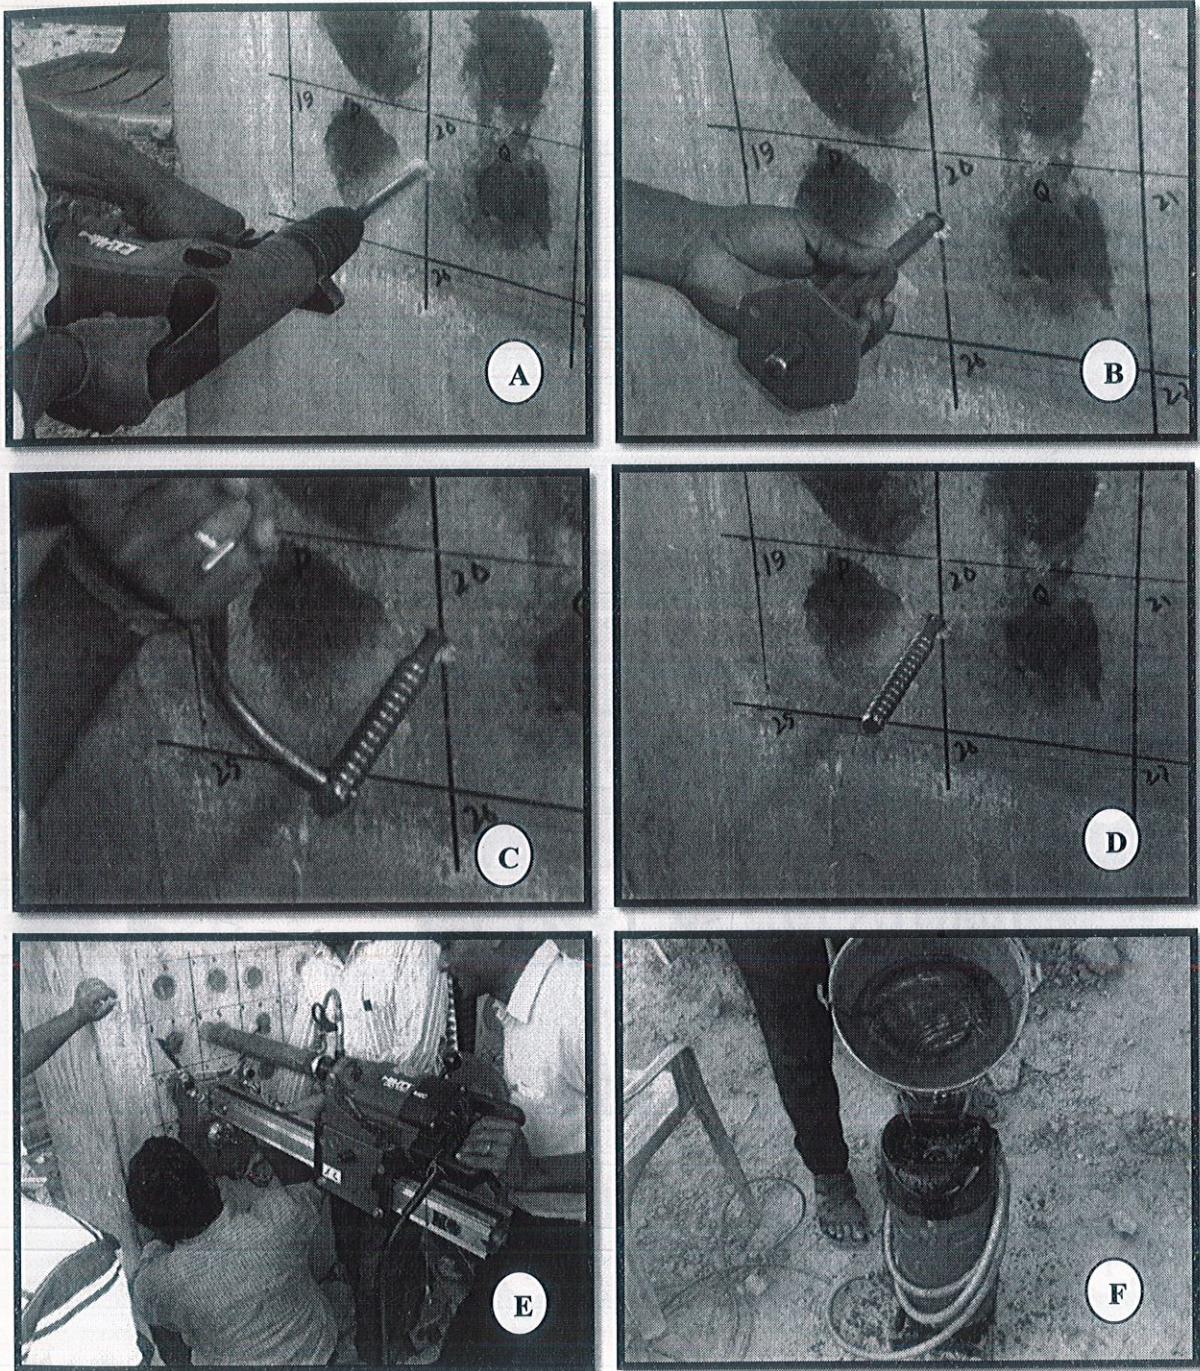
(A) Drilling hole for mounting threaded rod; (B) Flush Anchor; (C) Mounting Threaded Rod; (D) Mounted Threaded Rod; (E) Setting up the drilling assembly; (F) Mechanical Hydraulic Pump
